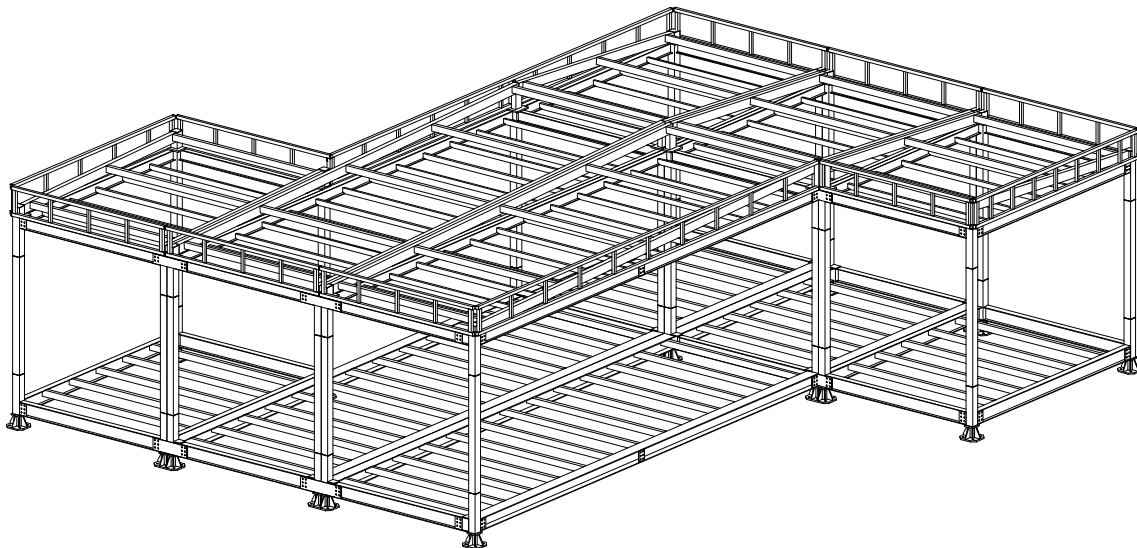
One story housing unit consisting of 8 separate modules - assembled
